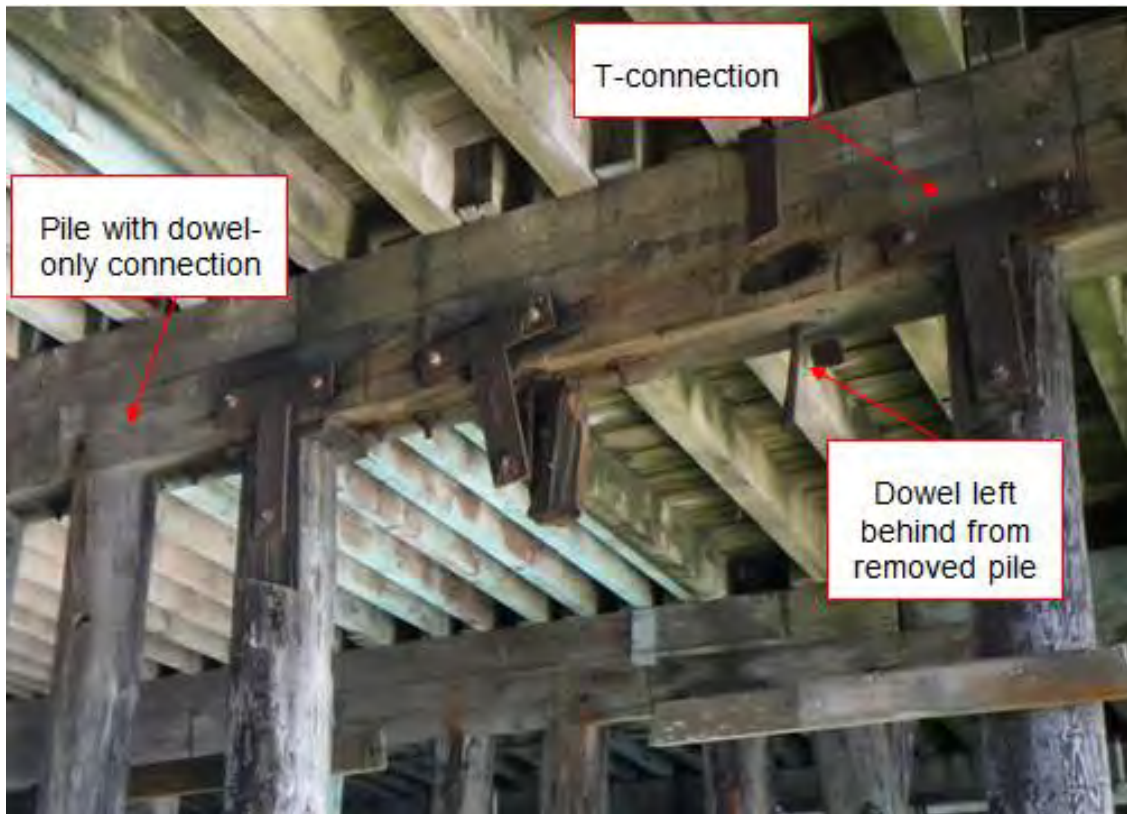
Dowel-only connection and T connections (Bent 47)
